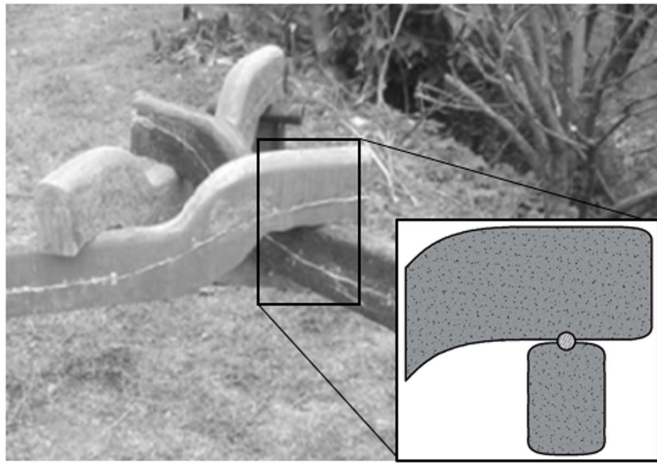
SM RS^{2D} with three fiber concrete beams with connection detailing. (Image courtesy of Attilio Pizzigoni.)
